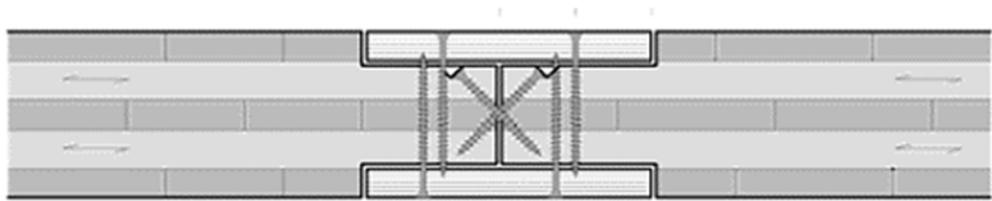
Detail: Cross laminated timber slab joint in secondary bearing direction<sup>165</sup>
